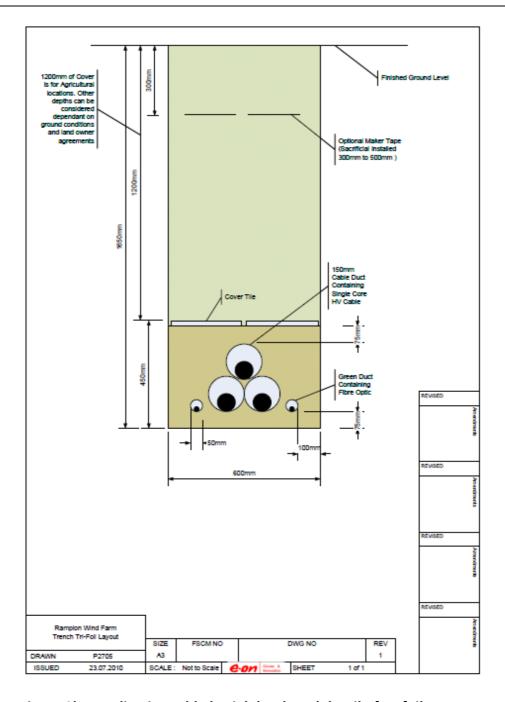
5: Indicative cable burial depth and detail of trefoil arrangement
